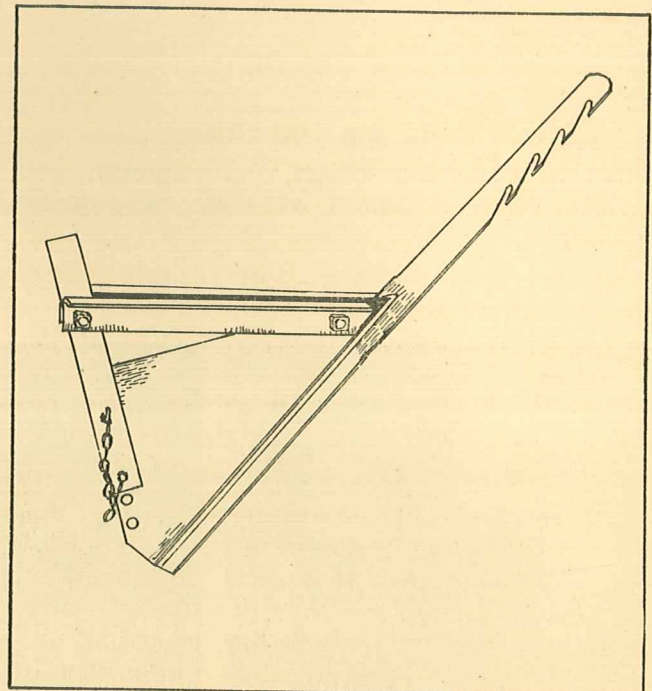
Roof bracket recommended for use when laying J-M Asbestos Shingles
